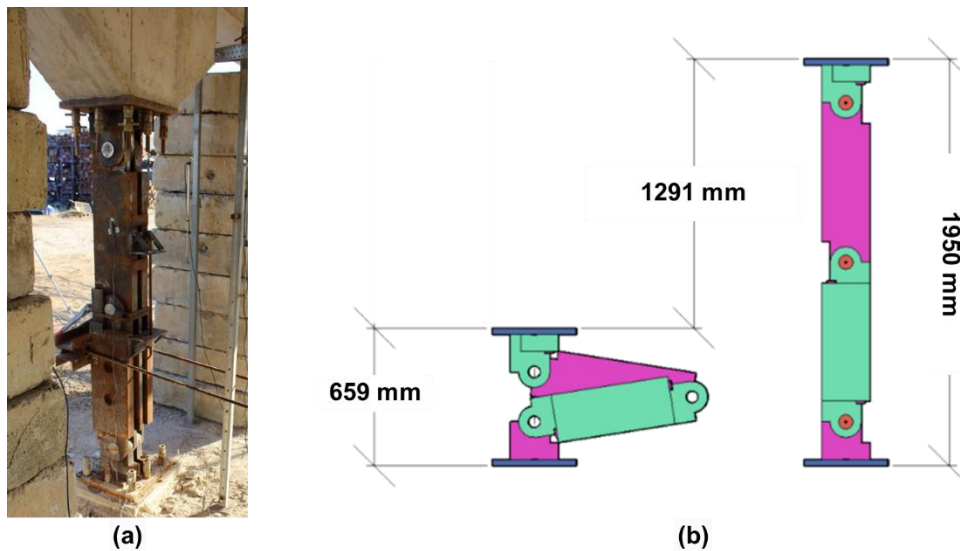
Purposely designed steel column with hinge mechanism for sudden column removal (Photo (a) courtesy of Manuel Buitrago).
